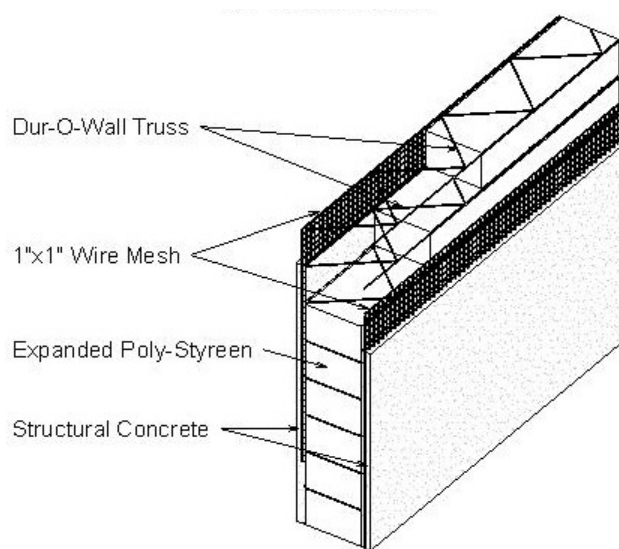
a. K-Panel Detail for Concrete Sandwich Panel
